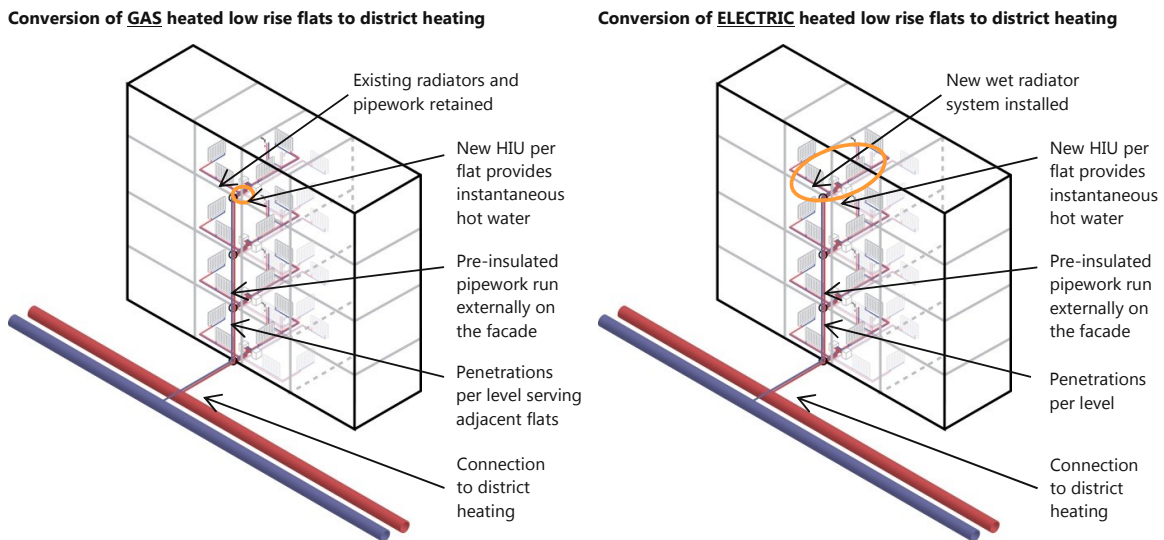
District heating connection strategy for gas (left) and electric (right) low rise converted flats.
